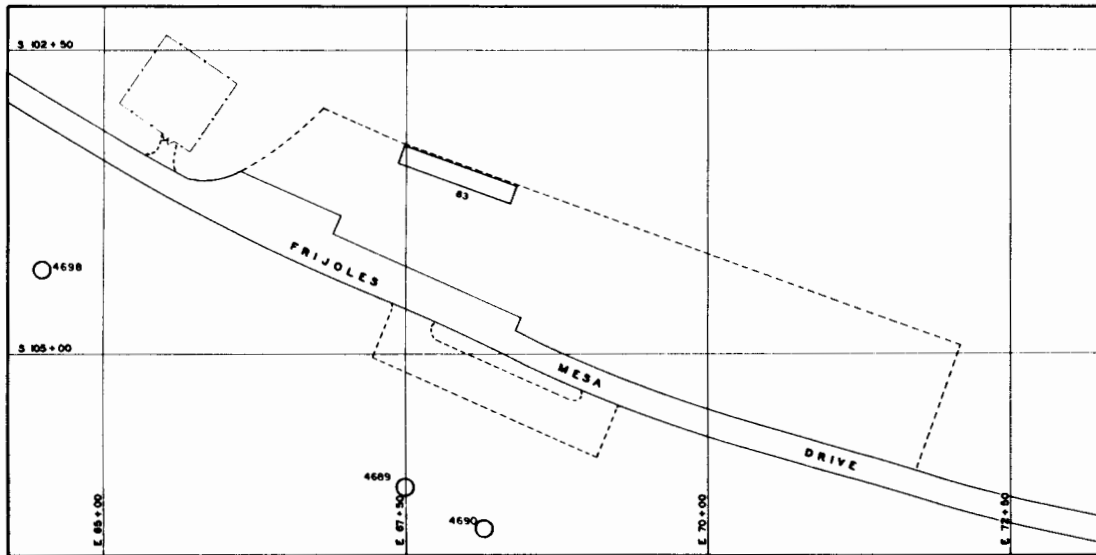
Structure Location Plan for TA-49 - Frijoles Mesa Site (1983 Drawing from the LANL Technical Area Structure Location Plans)
